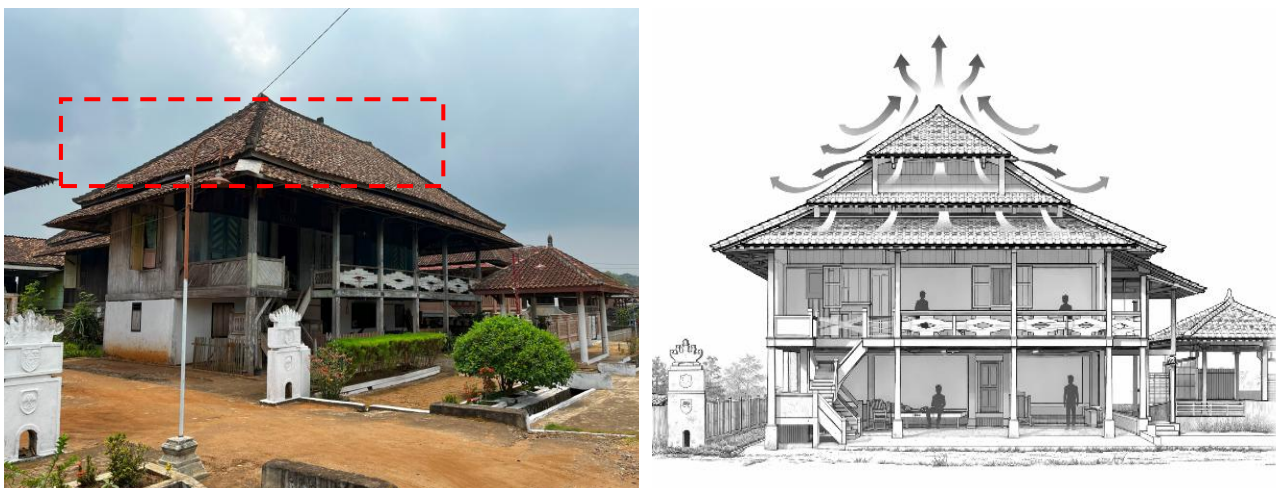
A tiered roof on a traditional south-facing building; (left) original photo, (right) AI illustration showing the cross-ventilation strategy on a tiered roof.
